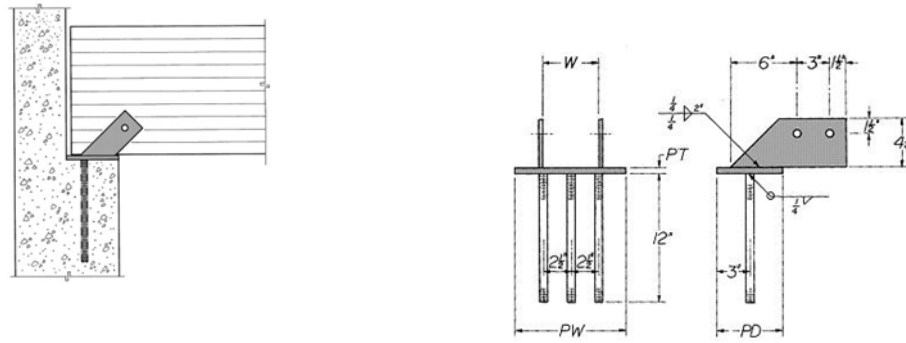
TYPICAL INSTALLATION OF THE TGLB BEAM SEAT HANGER AND ELEVATIONS OF THE THGLB BEAM SEAT HANGERS (See Table 1)
